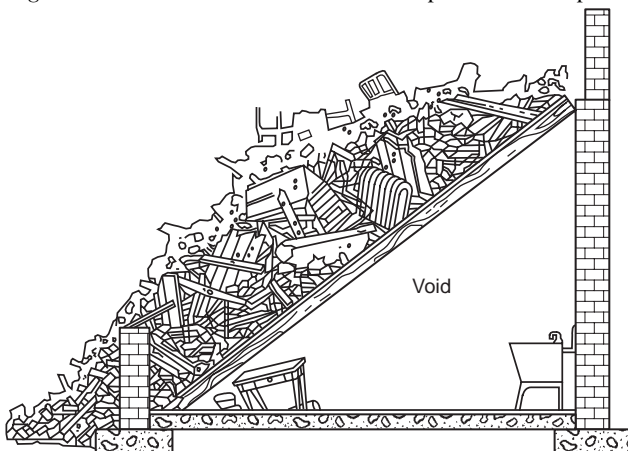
(f)(a) Lean-to floor collapse. (Courtesy of U.S. Department of Civil Defense)
